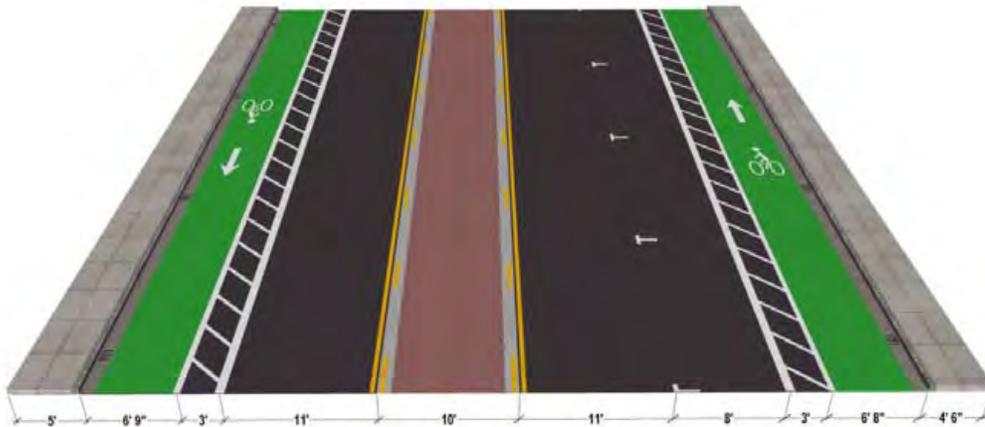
Typical Existing Configuration on Tiburon Boulevard
